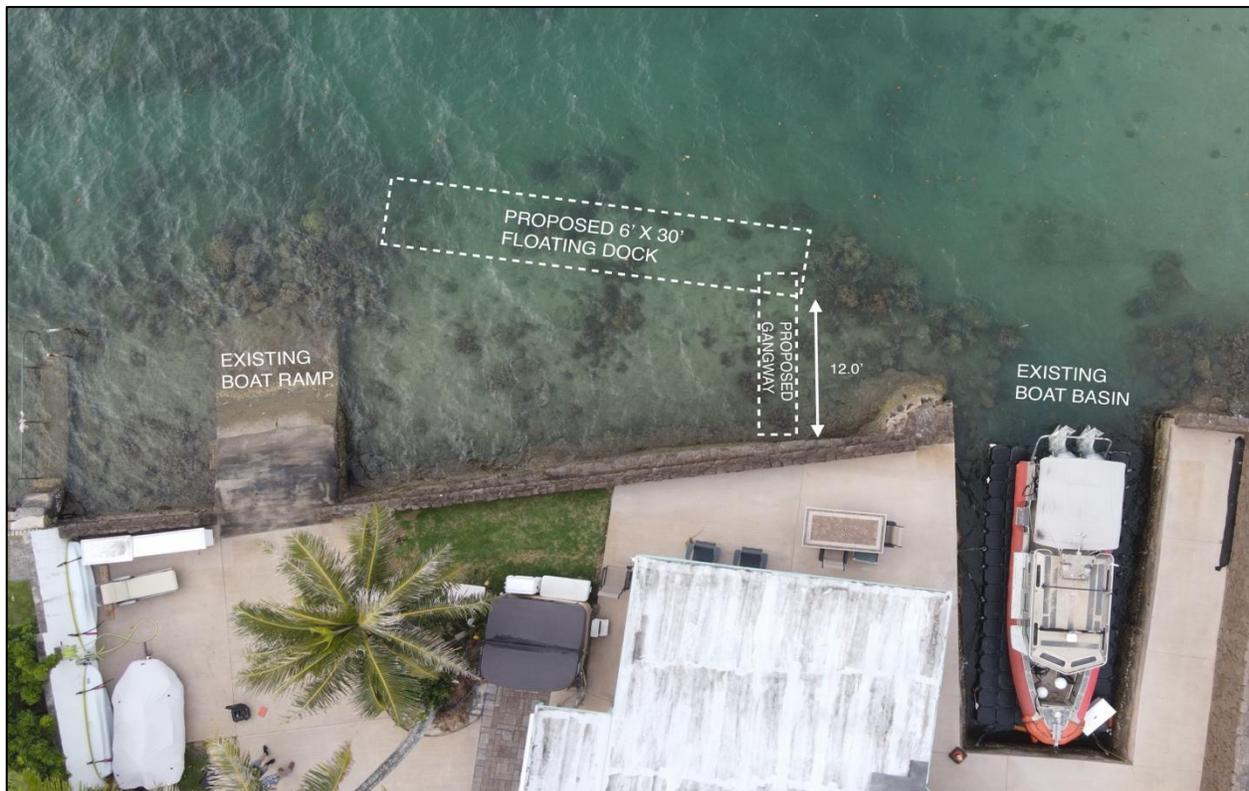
Plan view of the project site at 45-221 Ka Hanahou Circle. Proposed floating dock and access gangway is shown with a white dashed line. [Note- this was the original design. Since the preparation of this draft report the design has been updated to specify a 10-ft by 30-ft fixed dock and 14.9-ft by 4-ft gangway \(see memo at the beginning of this report. This Coral Transplantation Plan will be updated to reflect the new design when obtaining a Special Activity Permit from DLNR for the relocation of coral colonies during implementation of this project.](#)
